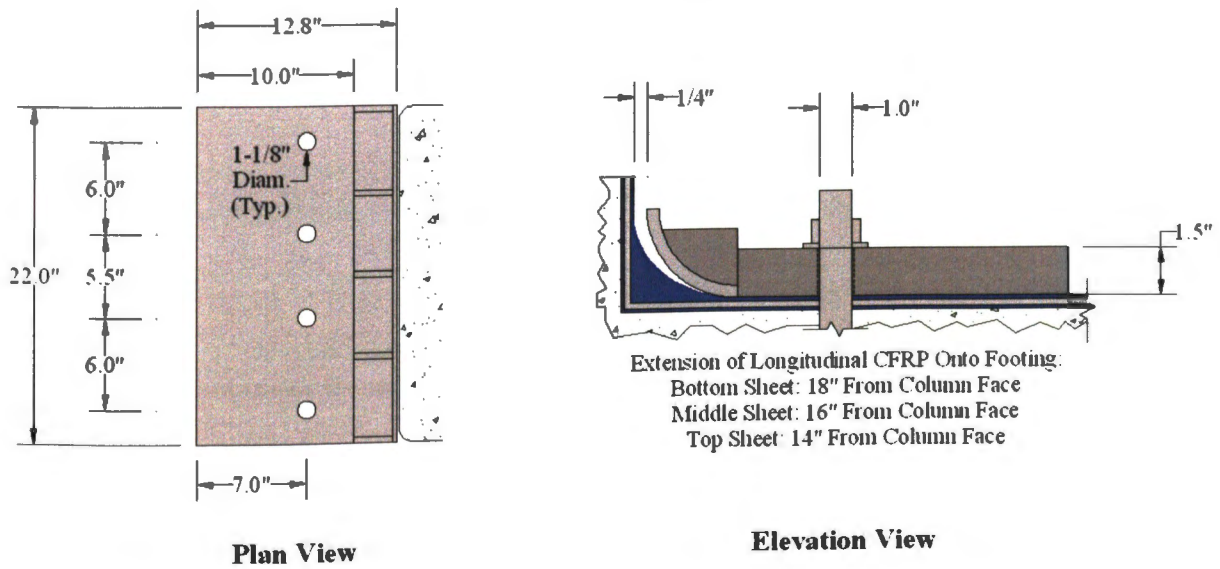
Final Details of Novel Anchorage System For Column #2
